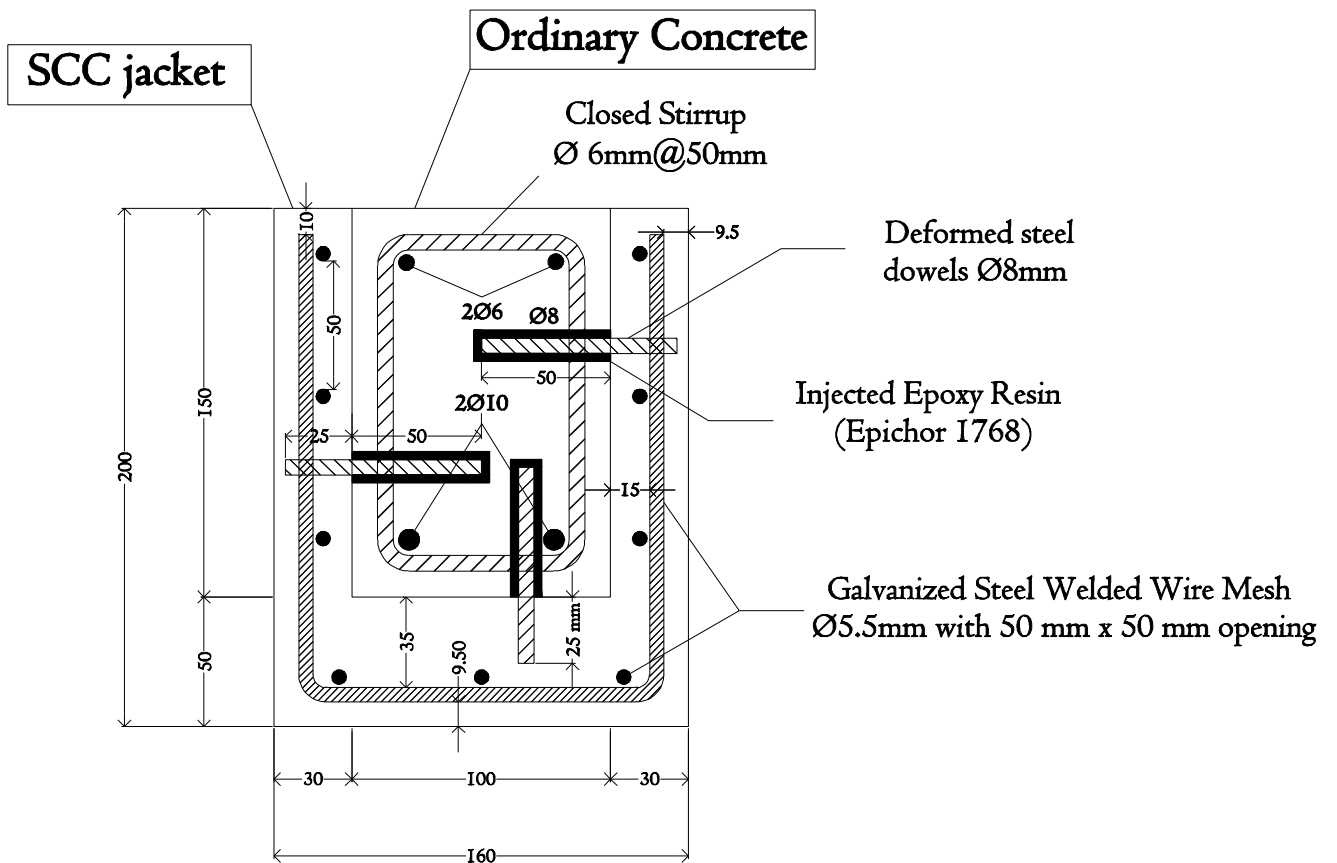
Strengthened beams GB.B3 and GB.B4 cross section (mm).
